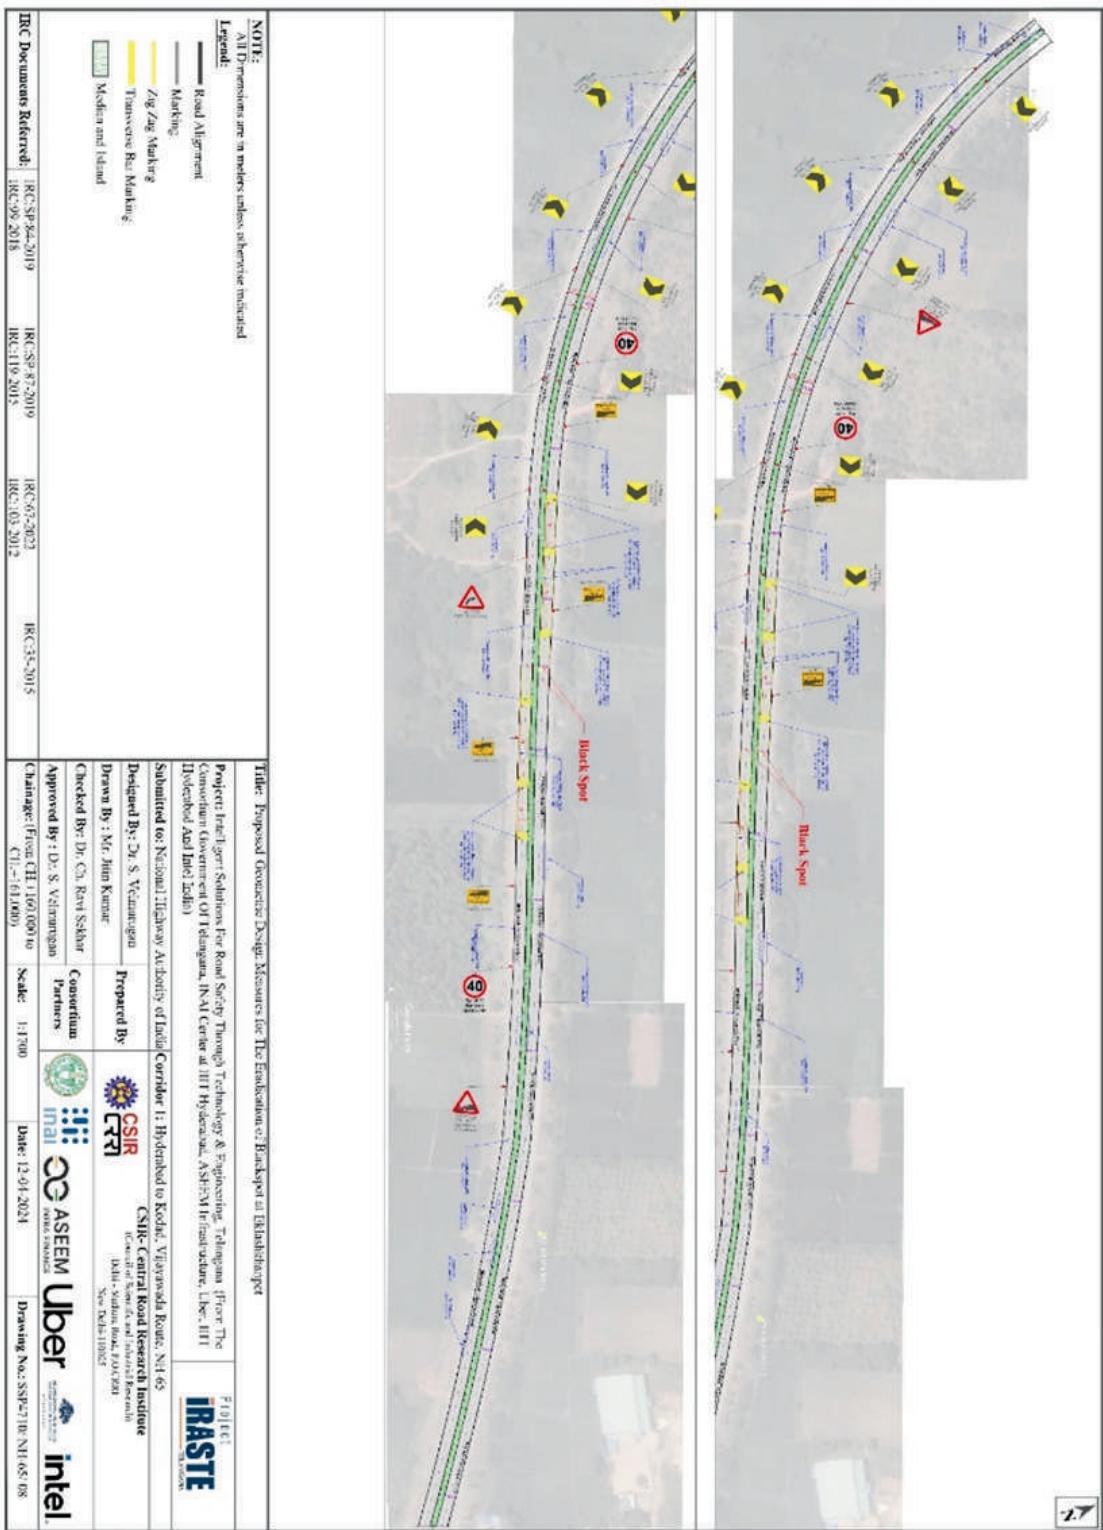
Detailed Geometric Design Plan (GDP) for the Ekkalashkhanpet Section of NH-65
